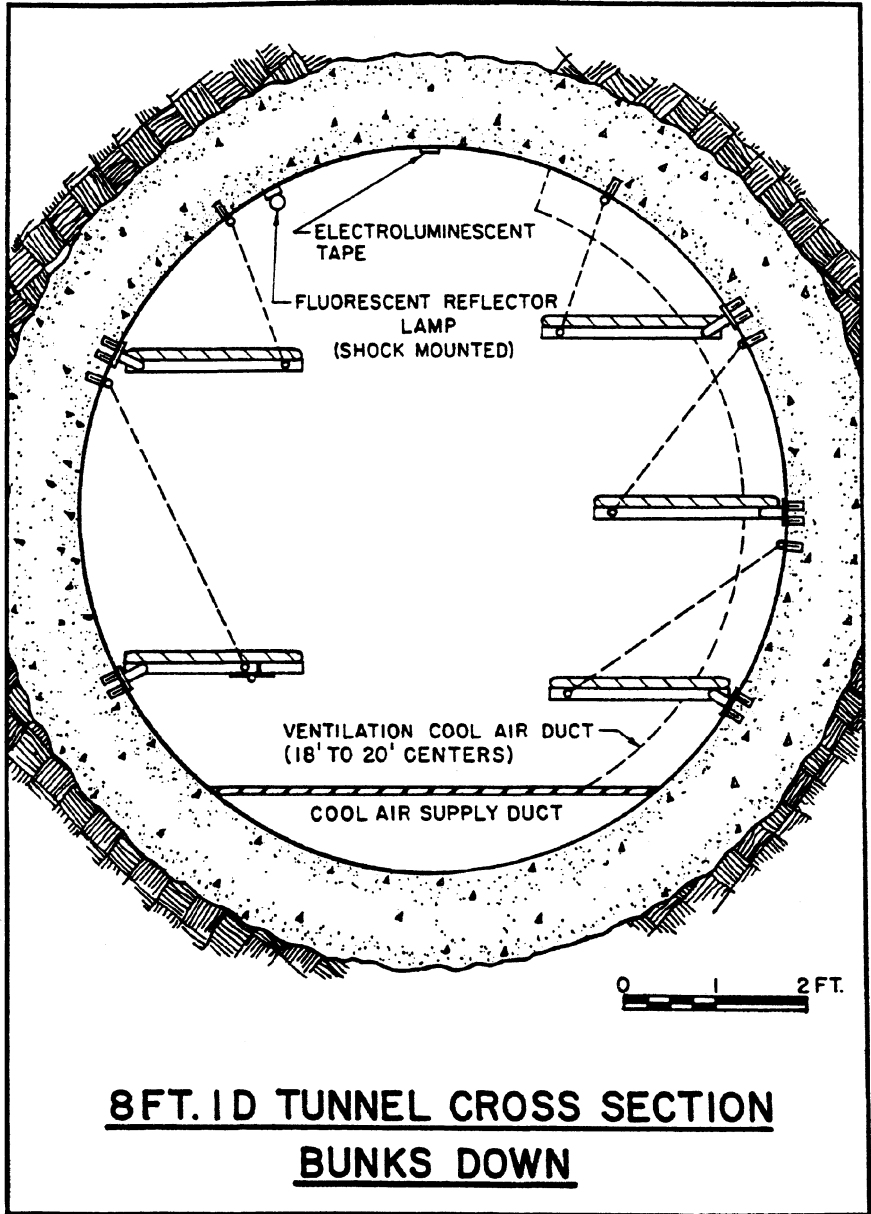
Typical cross section of a shelter tunnel with the sleeping bunks folded down. [Oak Ridge National Laboratory]
